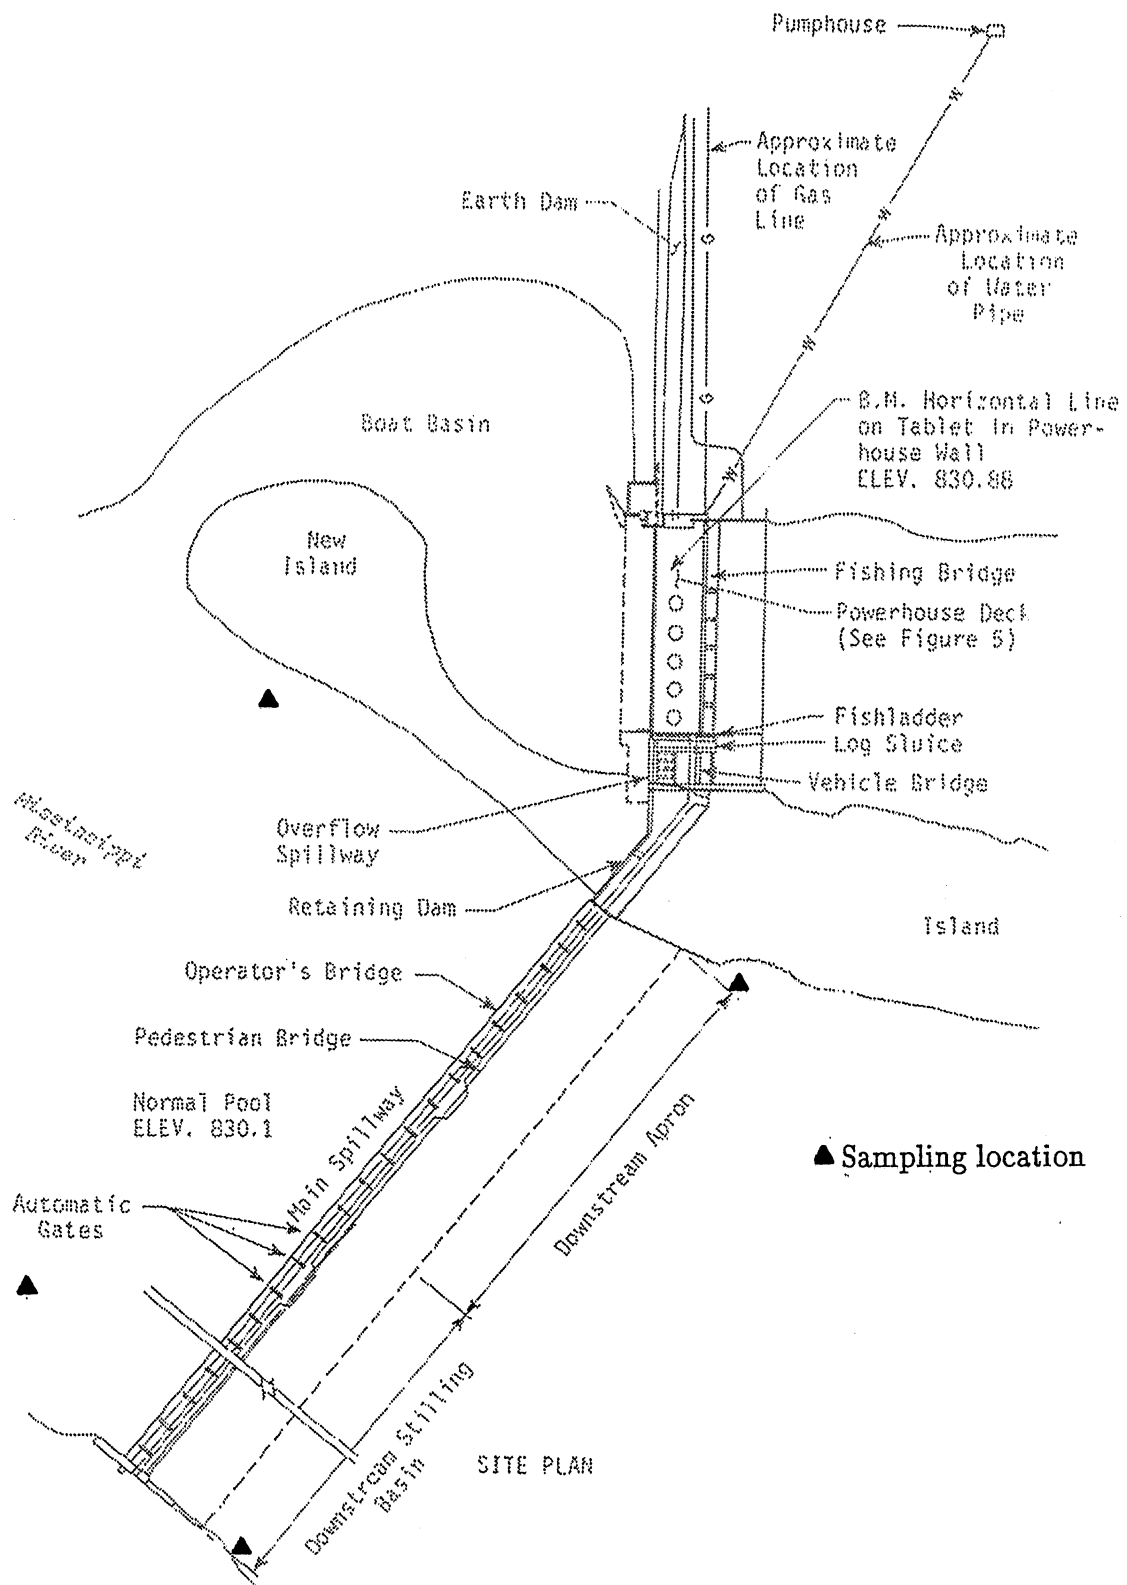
Plan view Coon Rapids Dam and sampling locations
